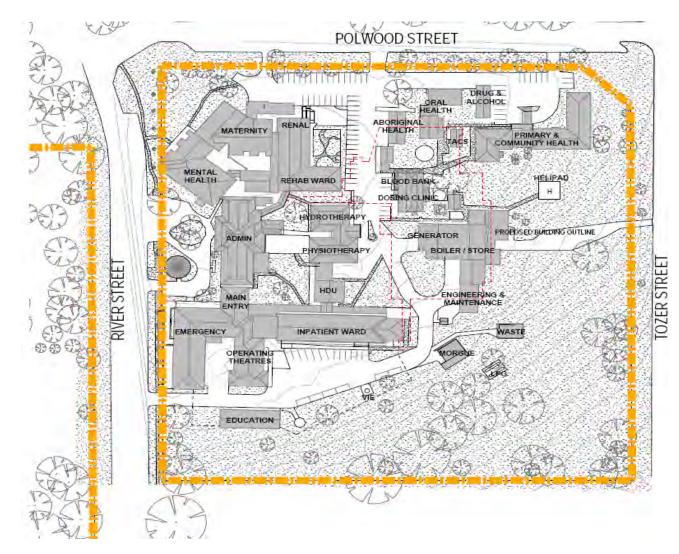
Kempsey Hospital – Existing Site Plan. Source – BVN Donovan Hill – Architects
